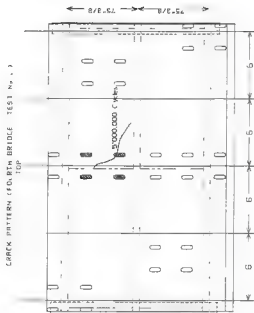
Top Cracking Pattern (Fourth Bridge - Test No 1 - Dynamic Load)
